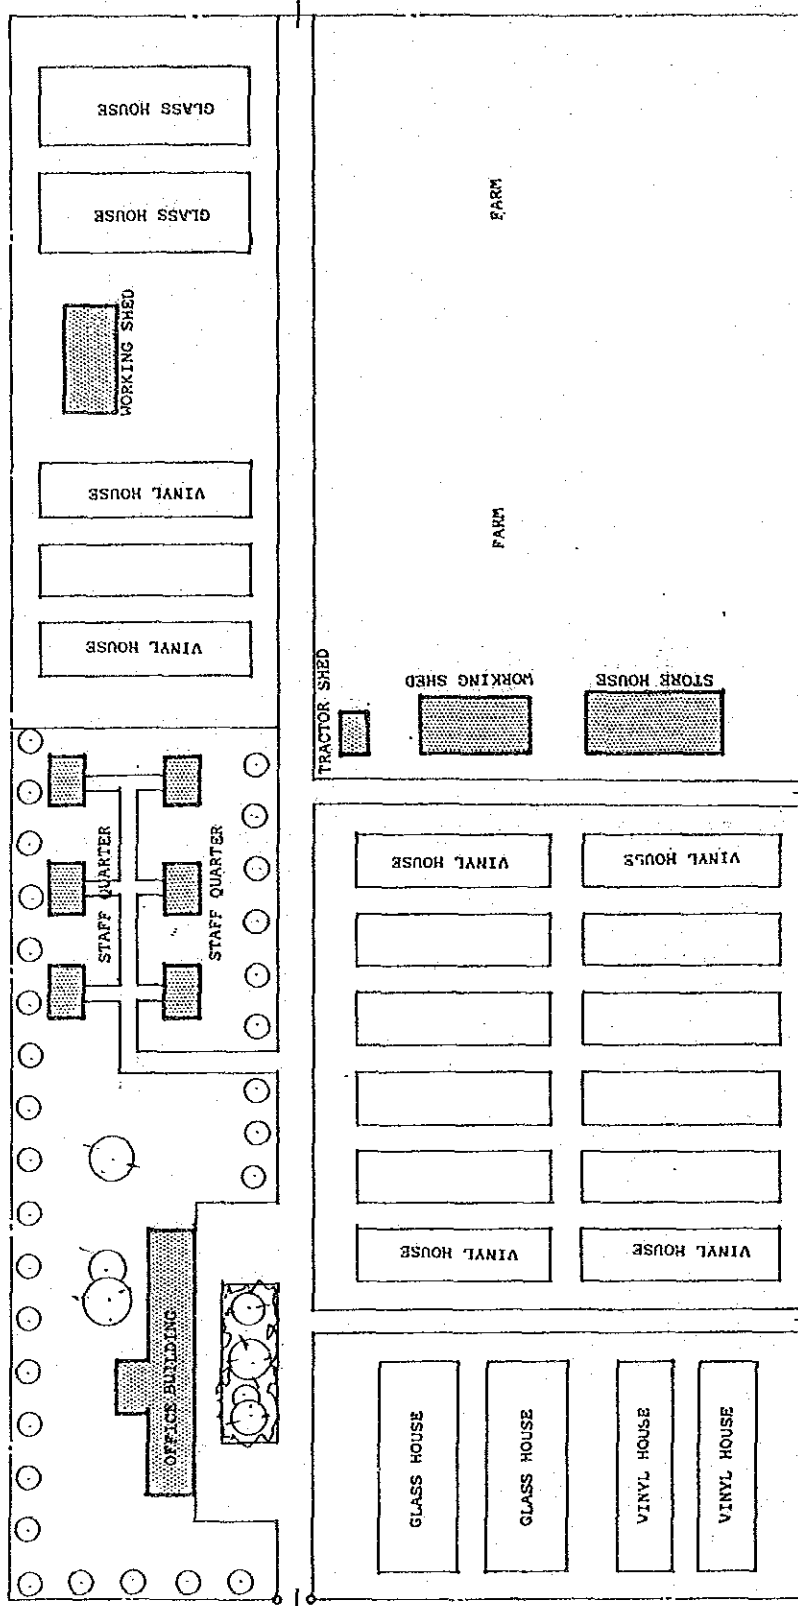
PROPOSED SITE PLAN OF INTENSIVE HORTICULTURE PILOT FARM
